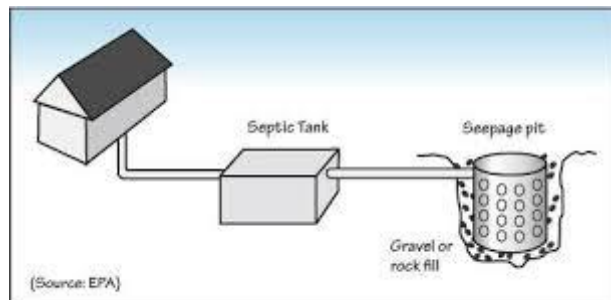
Schematic of a Seepage Pit (Dry Well)
